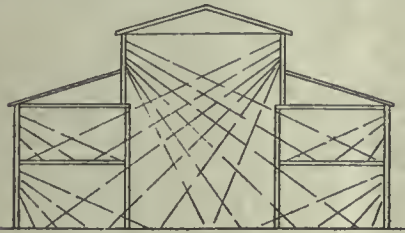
CROSS SECTION SHOWING LIGHTING ARRANGEMENT.
